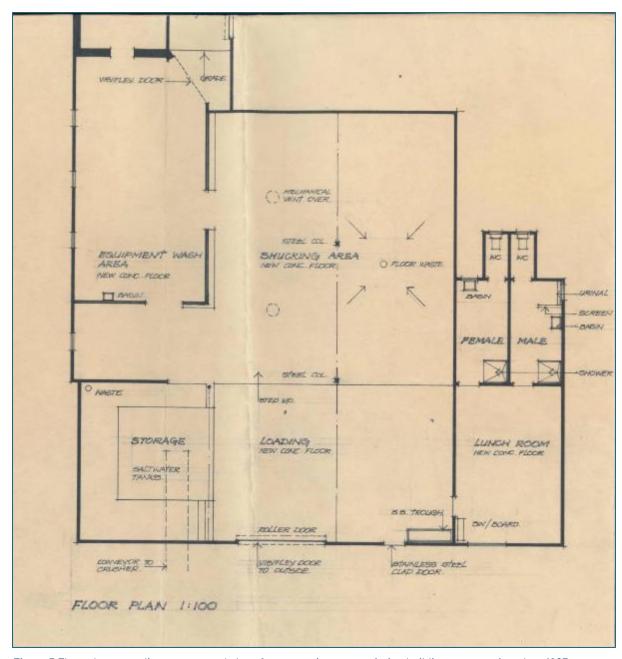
Floor plan according to approved plans for renovation to an existing building - processing plant 1983
